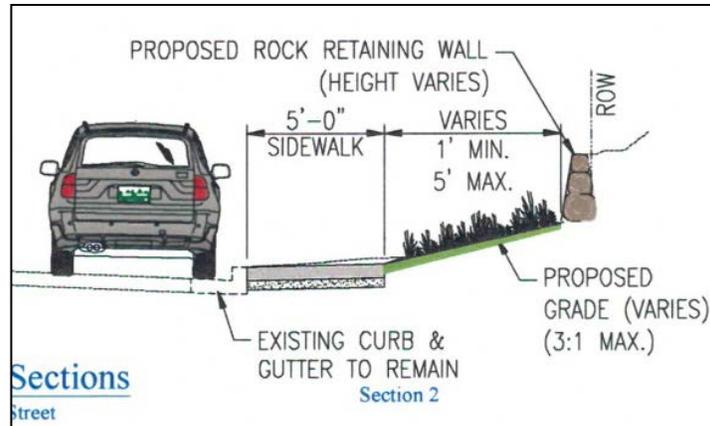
Section showing width & grade of sidewalk along Baseline Road between Grant Pl. and 9th Street, 2015.
